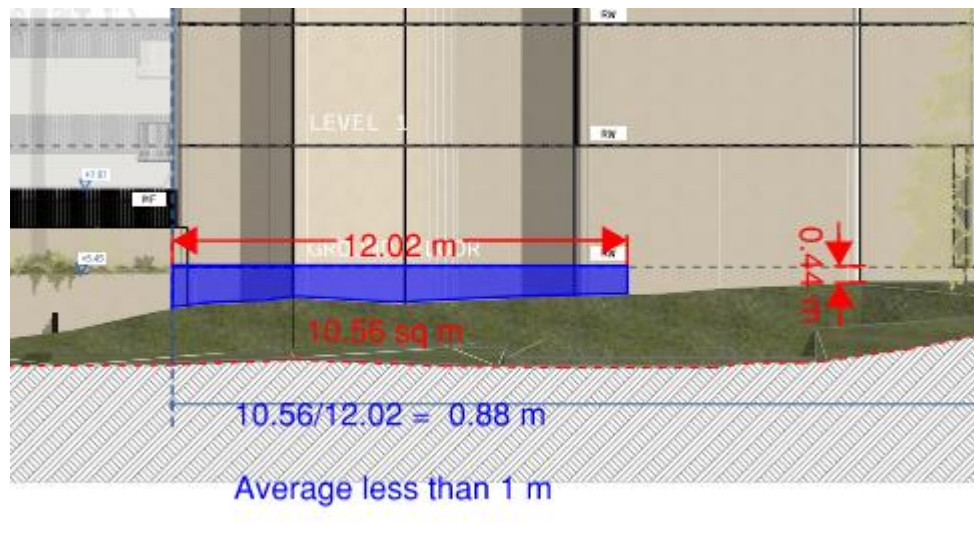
West Elevation With Exposed Basement 3 Wall
